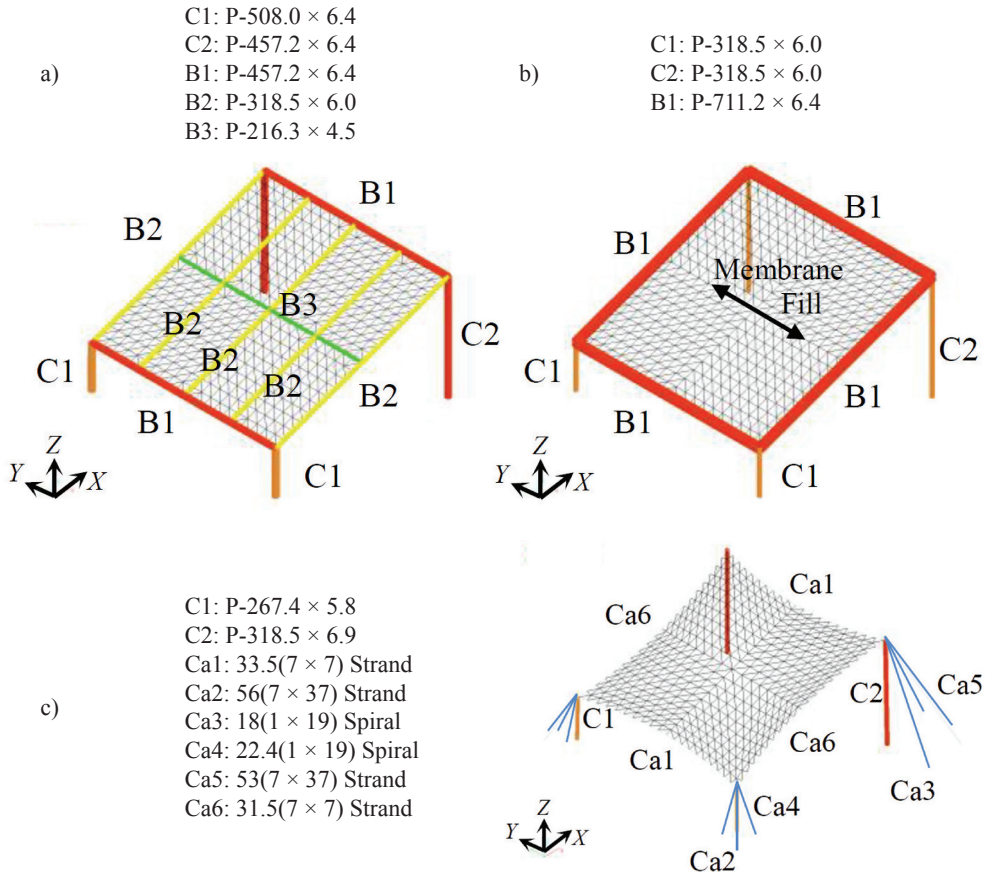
Mono-sloped roof structural models, a) frame type 1 (F1), b) frame type 2 (F2), c) suspension type (S1)
